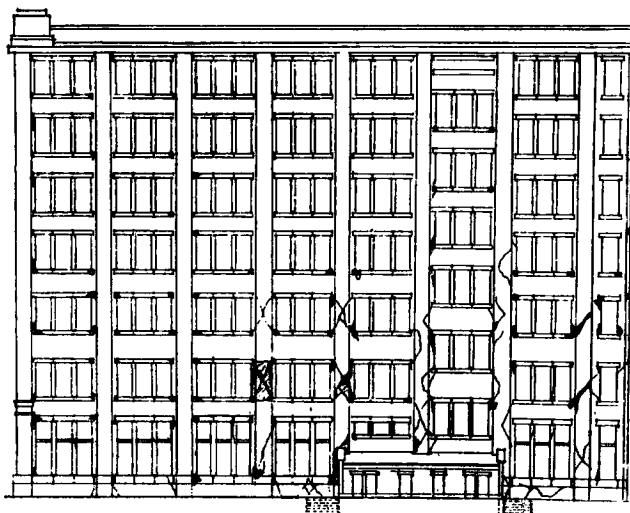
Shear Failure of Columns in Kaijo Building at Kanto Daishinsai
